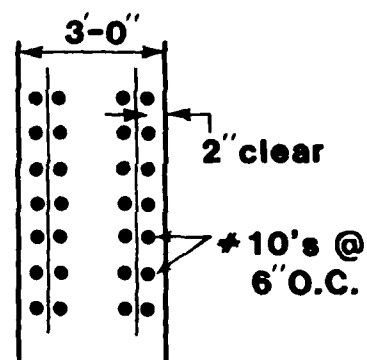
PROTOTYPE STRUCTURAL DETAILS
